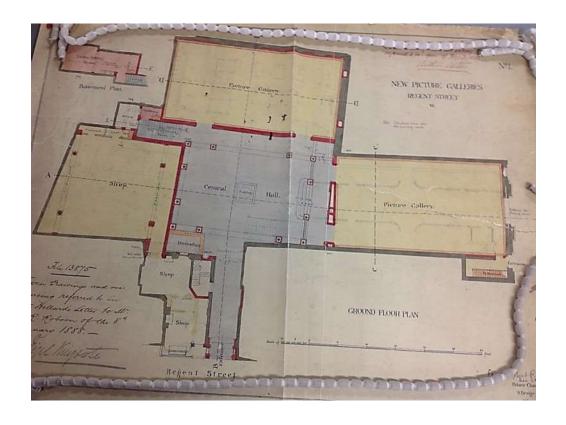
EDWARD R. ROBSON, GROUND FLOOR PLAN, NEW GALLERY, 1888. NATIONAL ARCHIVES.
